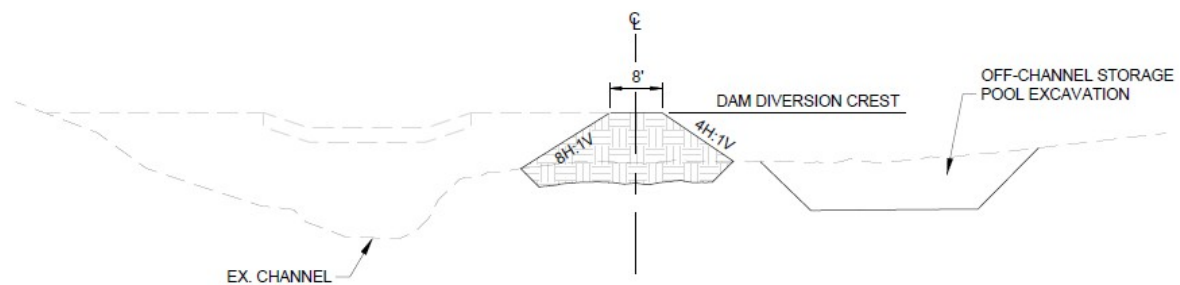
Typical Dam Diversion Extension and Off-Channel Storage Section
